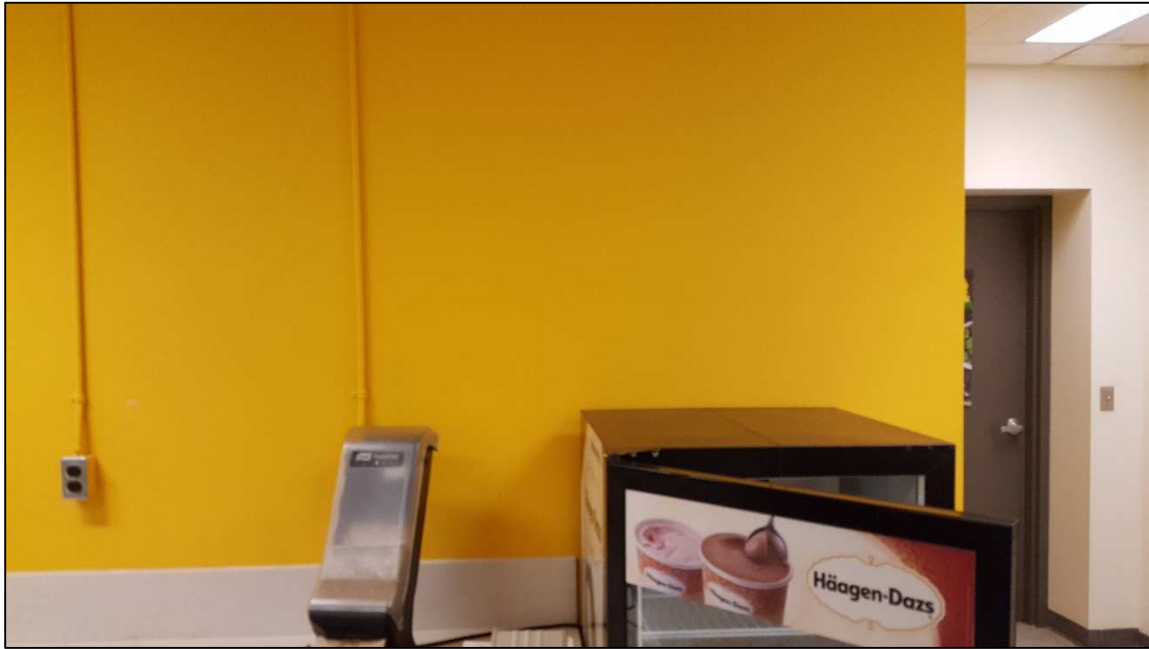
(February 6, 2018) – View of orange wall paint in Room 2026A
